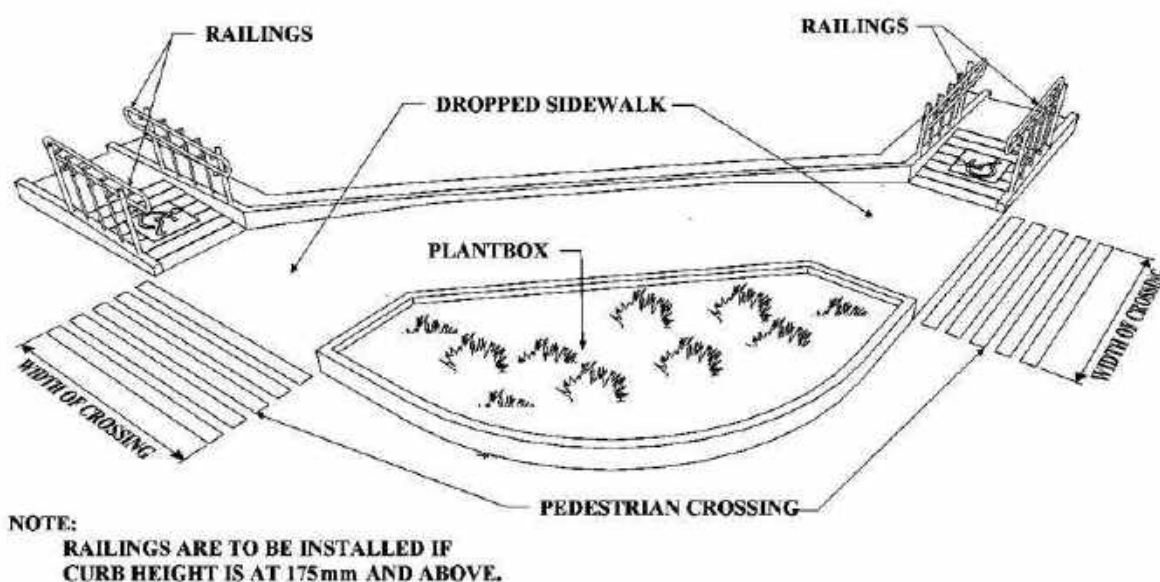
Perspective View of another variation of a Dropped Sidewalk at a Street Corner
